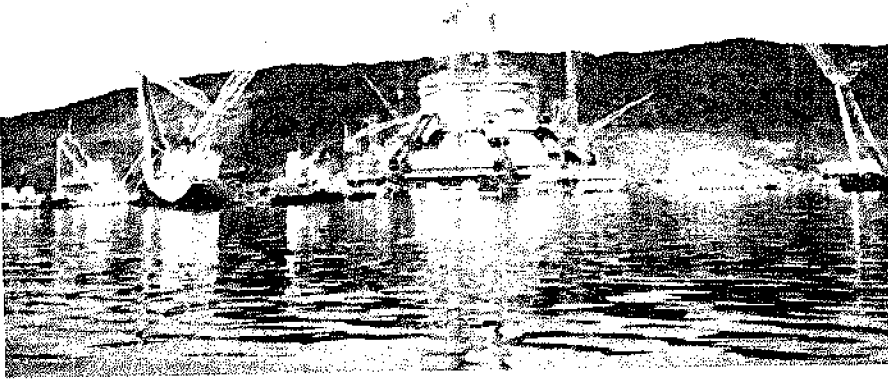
Ninian Central platform utilizes both precast and cast-in-place concrete construction.
